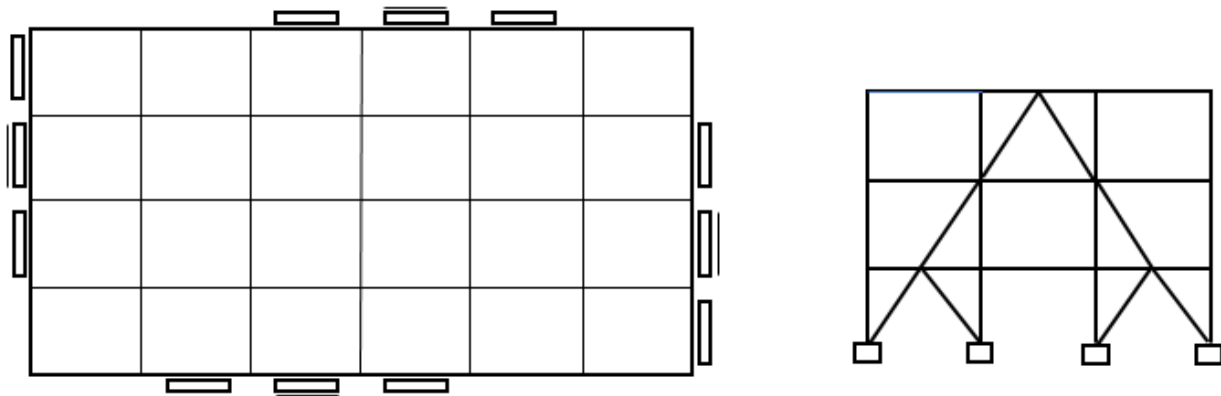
OCBF building model in OpenSees (Left: Plan view of building model and brace layout. Right: Brace Configuration.)
